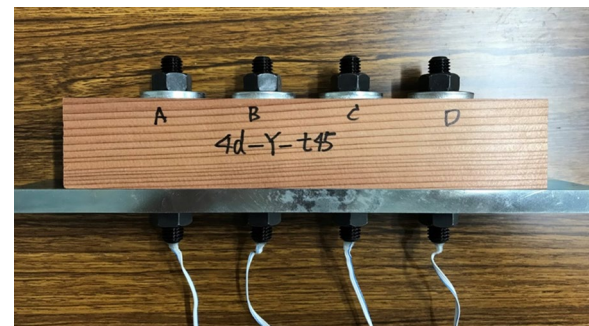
Typical test piece (S : 48 mm; T_h : 45 mm)
